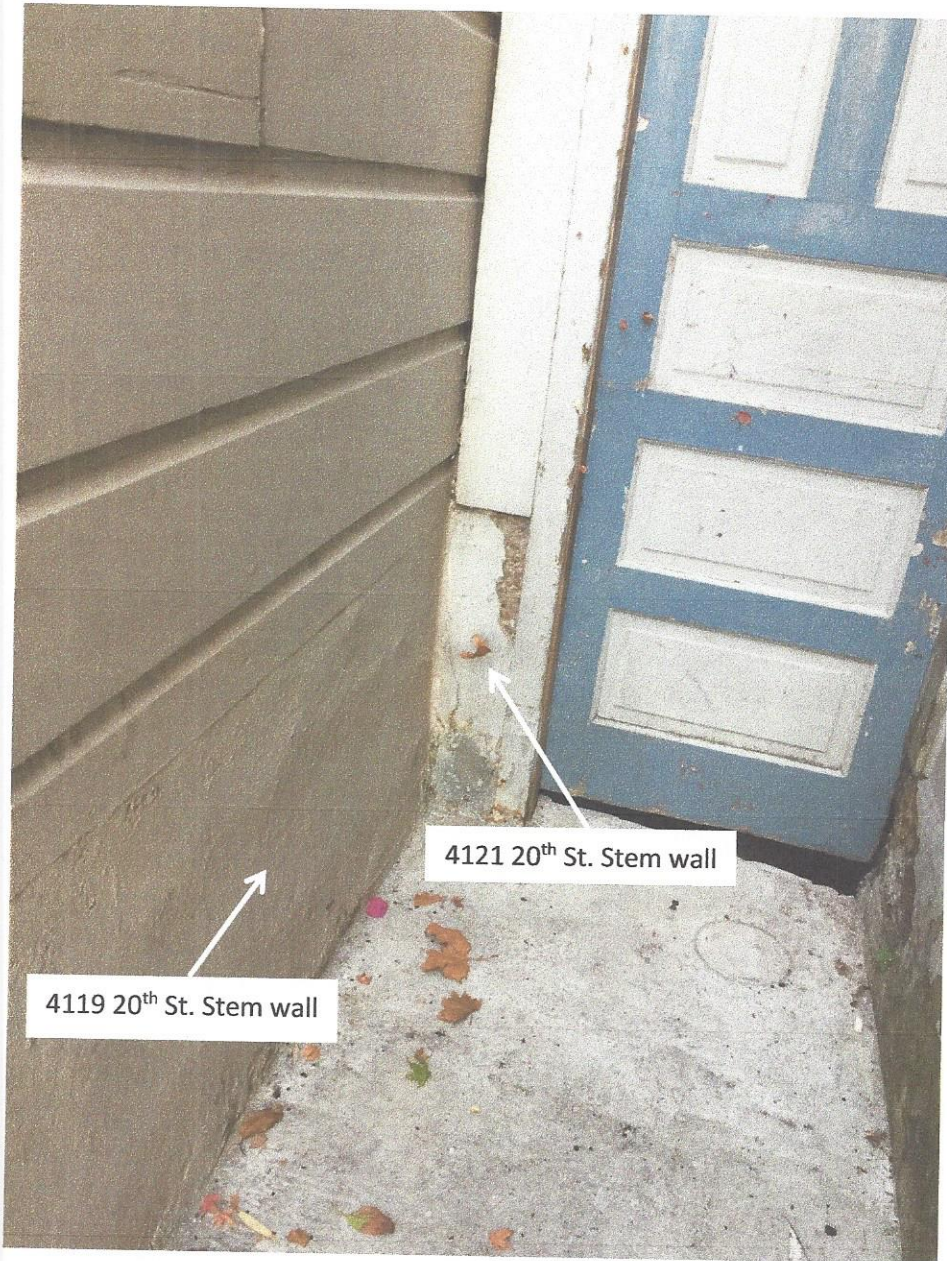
indicates 4119 20th St. and 4121 20th St. footings are most likely the same elevation. Proposed basement finish elevation is 2 feet lower than walkway existing elevation. Detail 1/S-2 represents actual site condition.
